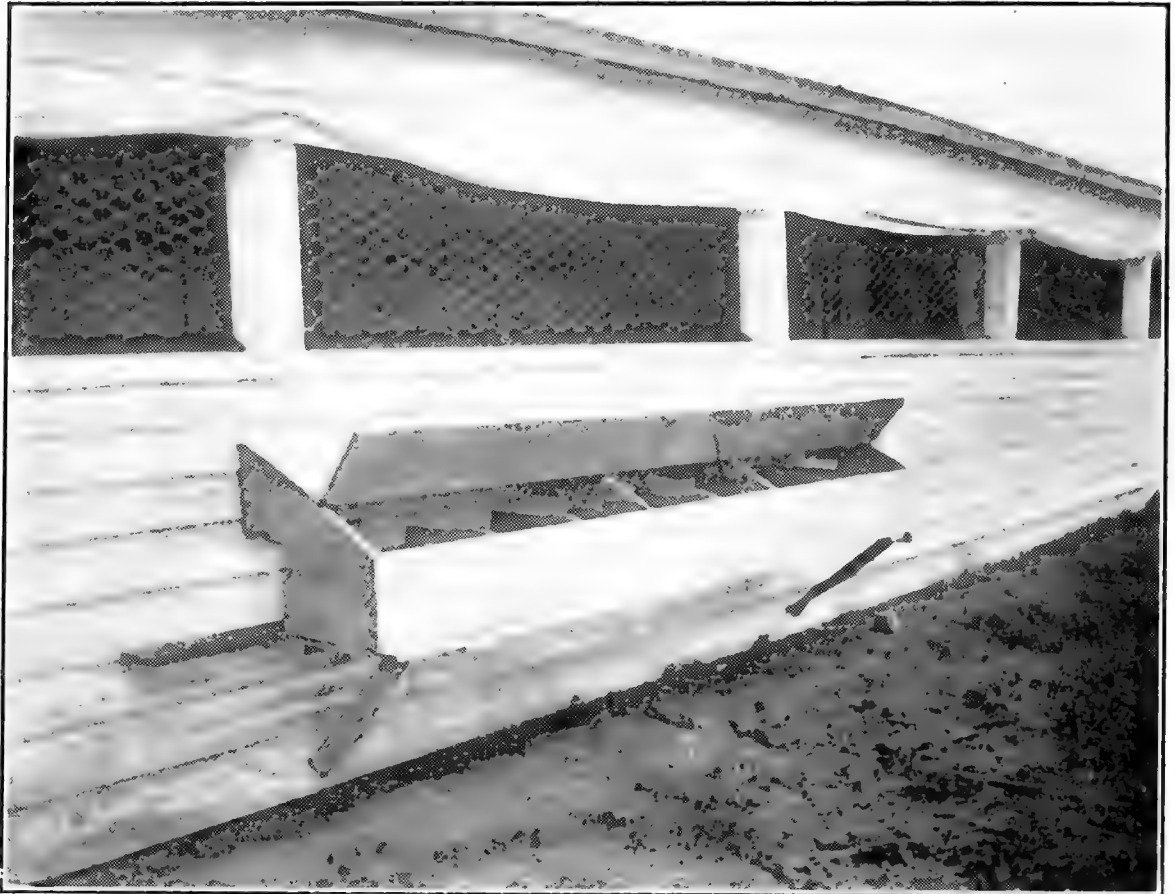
This illustrates cluster of eight nests placed outside of the poultry house to get a clear view, with hinged cover open. Make floor nine feet six inches long by twenty-one inches wide. One floor board seven inches wide should be two feet longer. Place this board at rear of floor. This will project out one foot at each end for hens to jump up on when entering nests. This board serves as the runway for all the nests. Lumber cut for this nest should be three-quarter-inch boards; six pieces nine and a half feet long by seven inches wide, two for floor, four for cover; one piece eleven and a half feet long by seven inches wide, long floor board; one piece nine and a half feet long by twelve inches wide, front of nests; one piece nine and a half feet long by six inches wide, inside for nests; nine pieces thirteen inches long by twelve inches wide, ends and partitions; four pieces twenty-one inches long cut to square mitre, or 12x12 pitch. Nail together, as shown in figures 4
